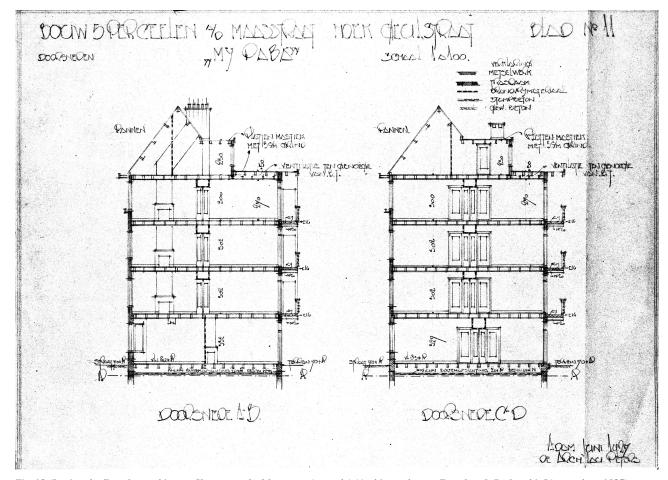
Sections by Baanders architects of houses on the Maasstraat (no scale) (Architectenbureau Baanders & Stadsarchief Amsterdam, 1927).
